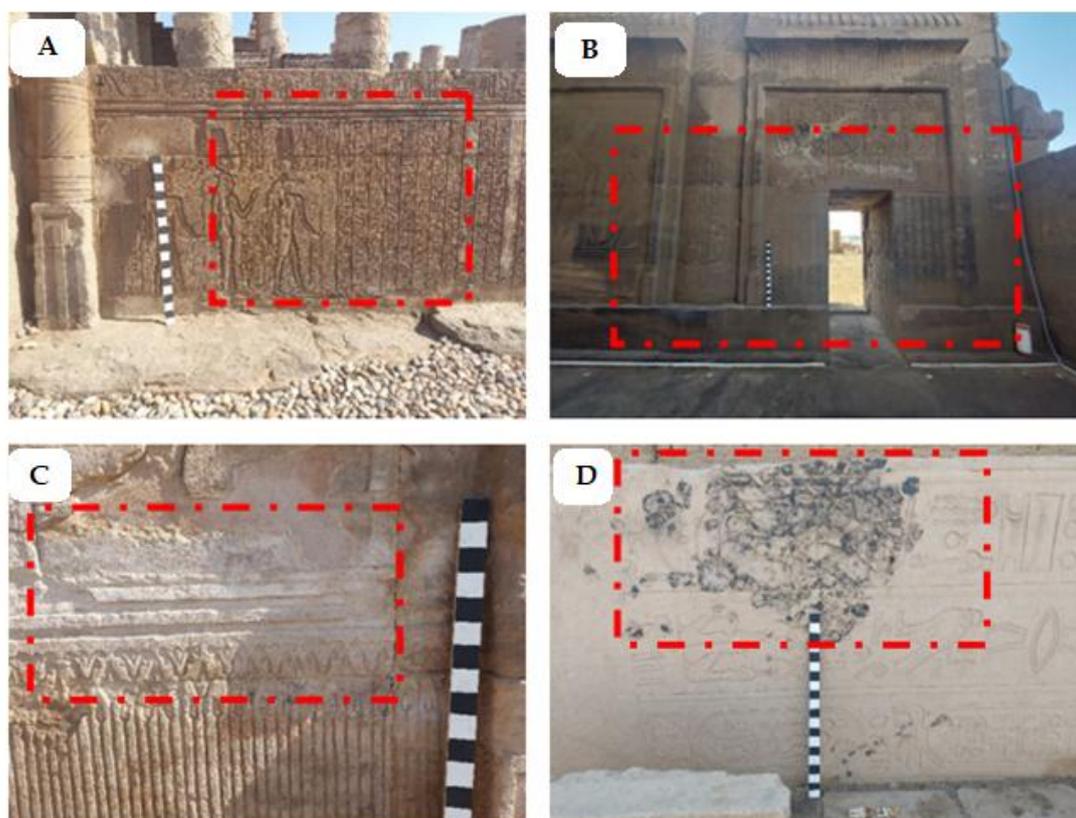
Different deterioration forms on the walls of Kom Ombo temple, A, B) Moistened walls with adhered soiling materials, C) Salt efflorescence on the walls, D) Accumulation of soot layers.
